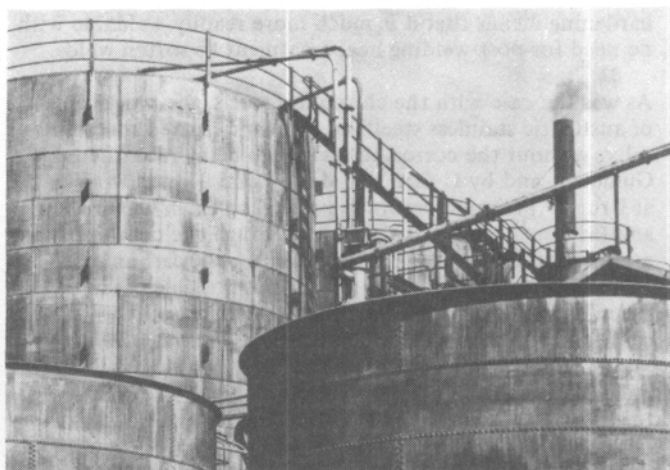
Detail from Fig 1 showing welded construction.
